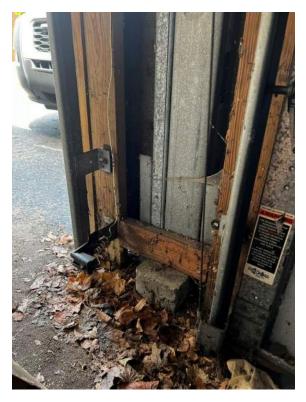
IMG_1041 Addition – Metal stud does not rest on built foundation.
